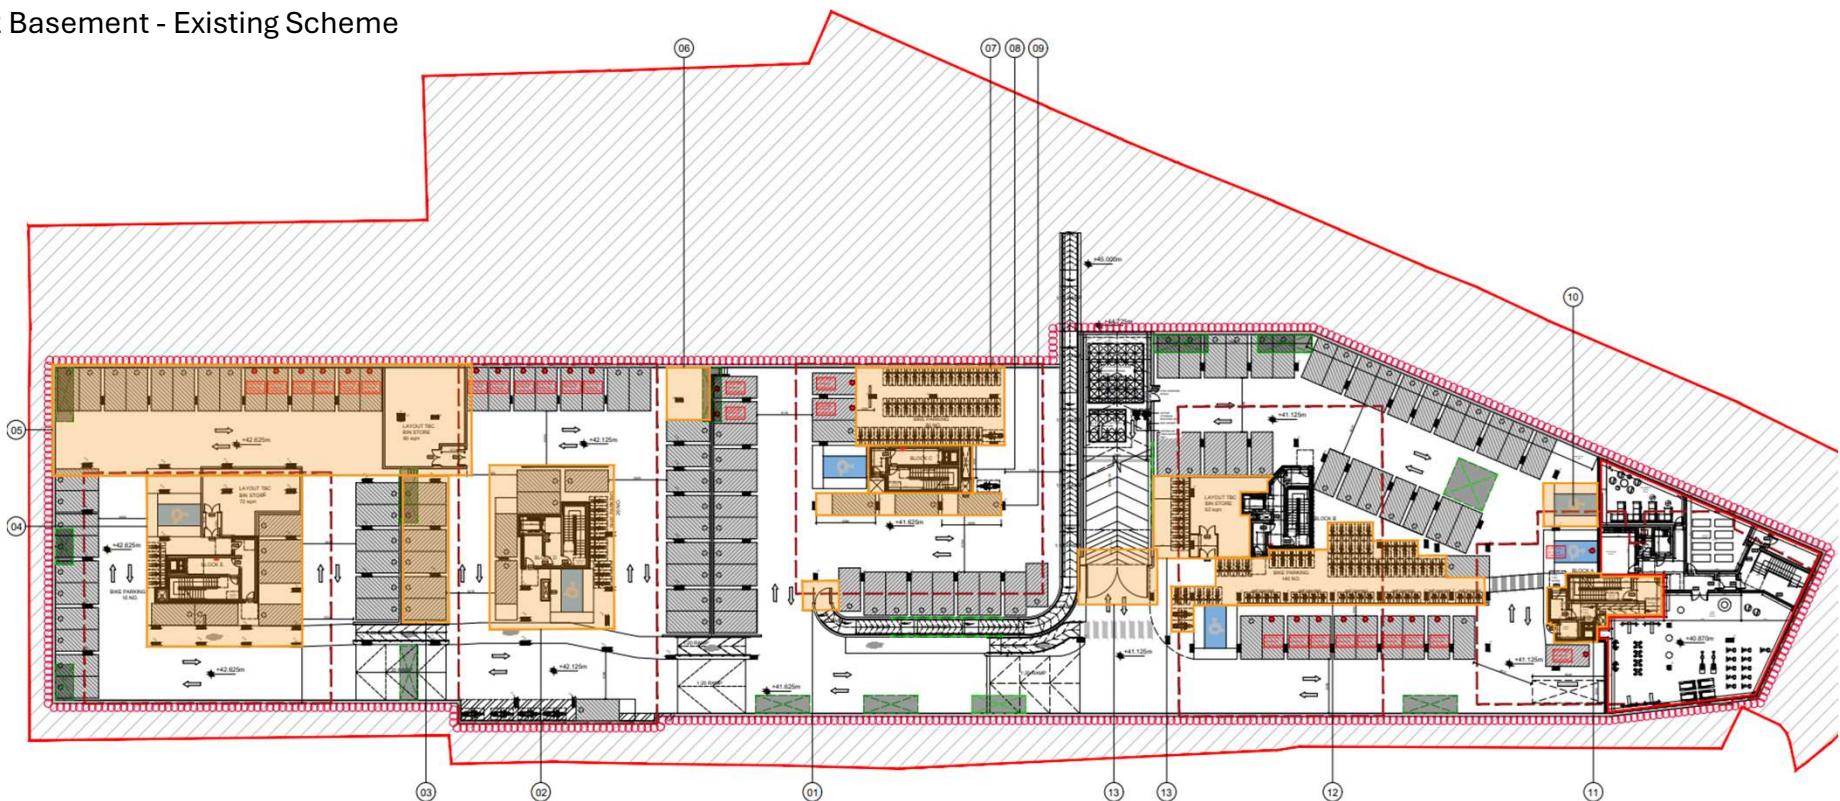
Basement Floor Plan – Extracted from Existing Scheme
